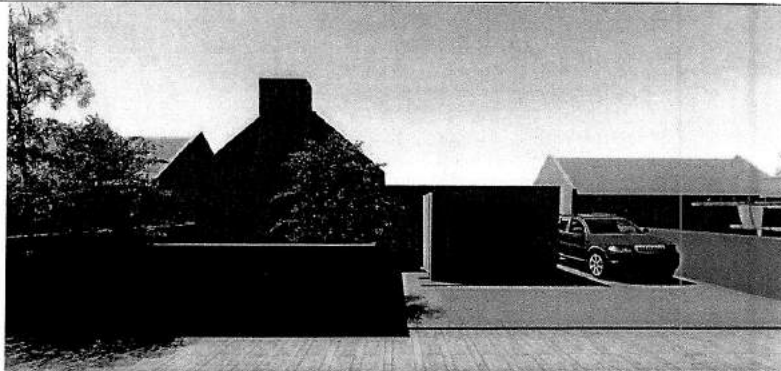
Extracts from the Architectural Guidelines showing a typical streetscape and an elevation of the architectural style and character of the housing proposed for the development area.
